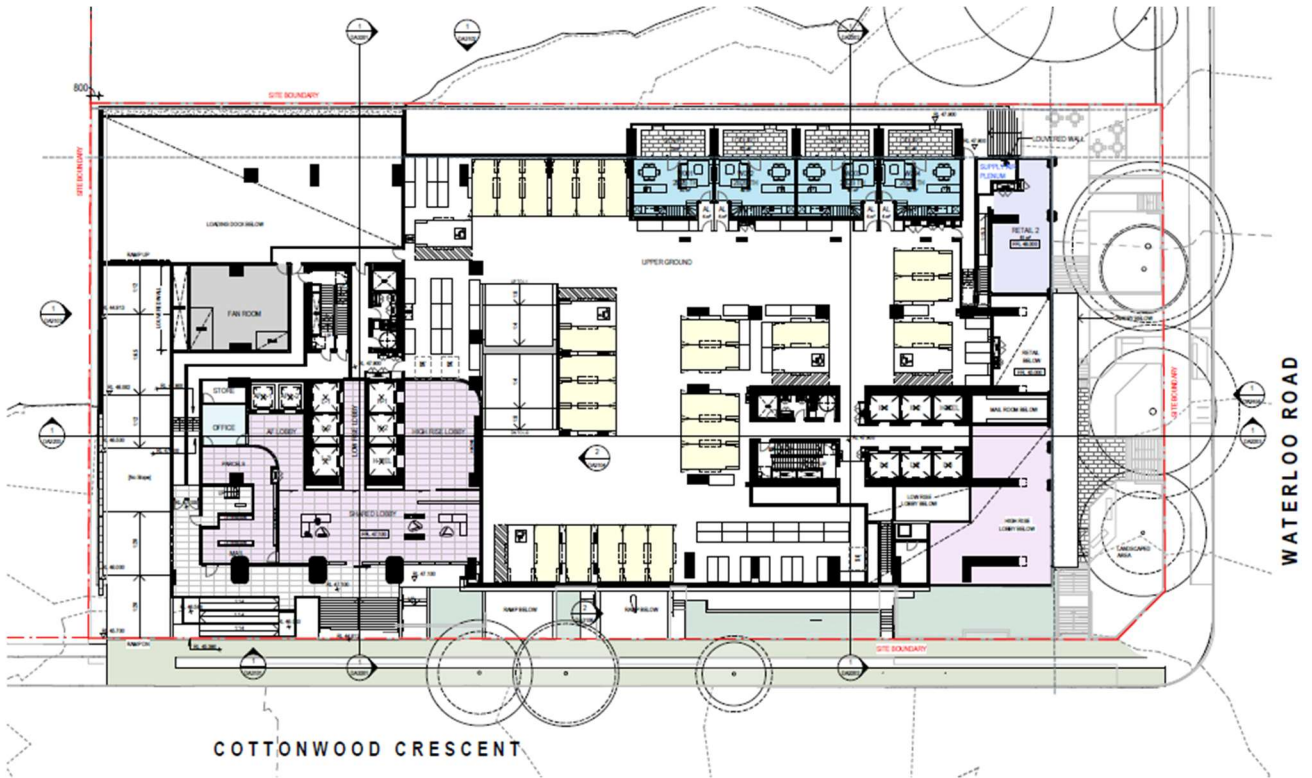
Extract of proposed plans: Upper Ground Floor (DA2008).
